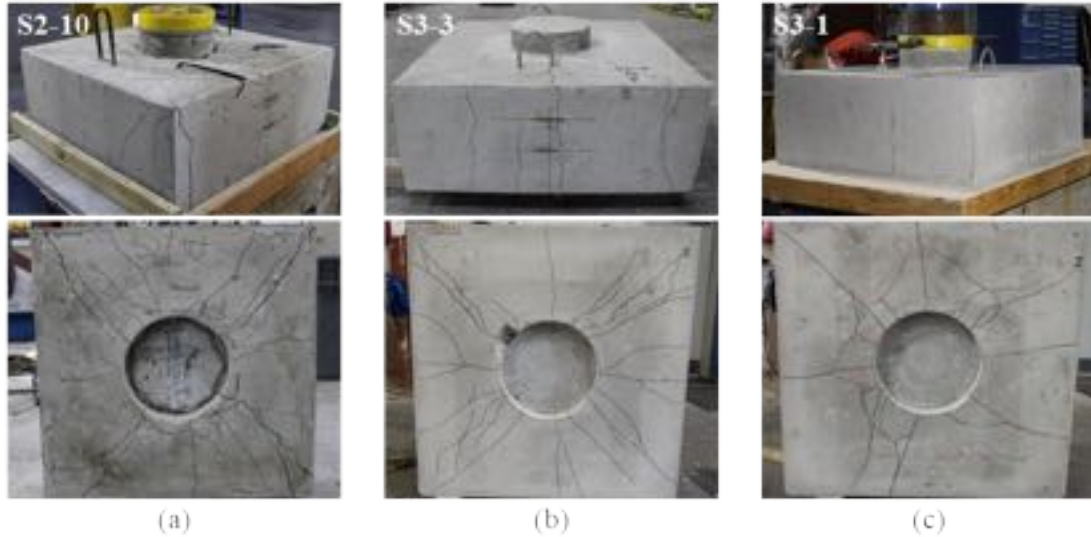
Crack pattern at failure for specimens with varying amounts of longitudinal reinforcement (a) typical, (b) 2/3, and (c) no longitudinal reinforcement
